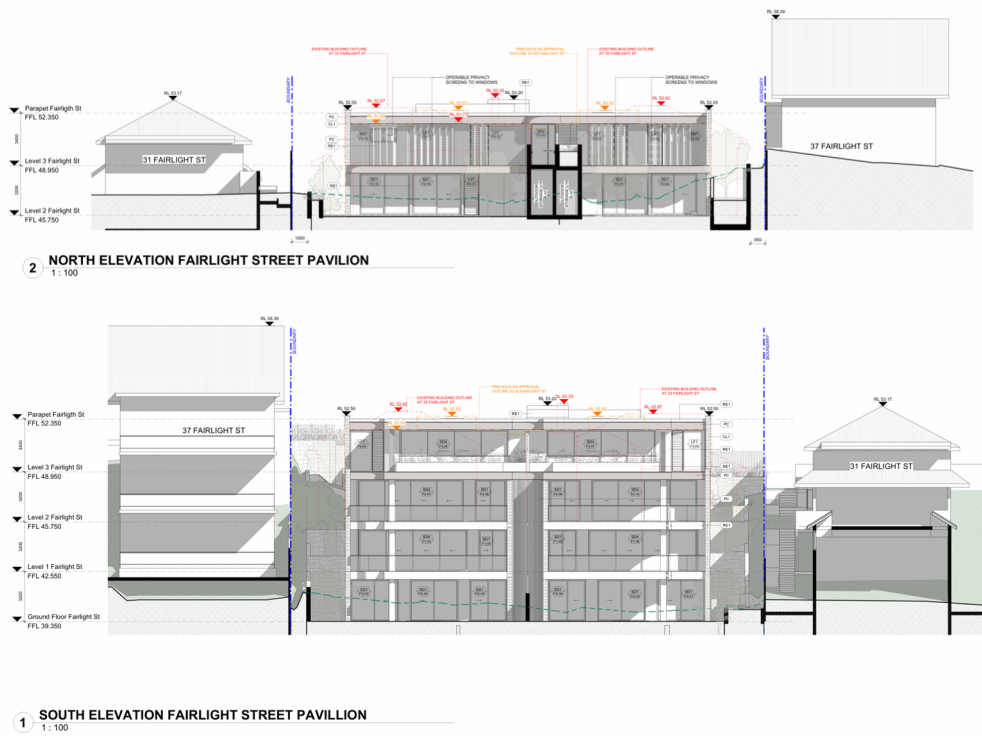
Northern and Southern Elevations (Source: Platform Architects)
